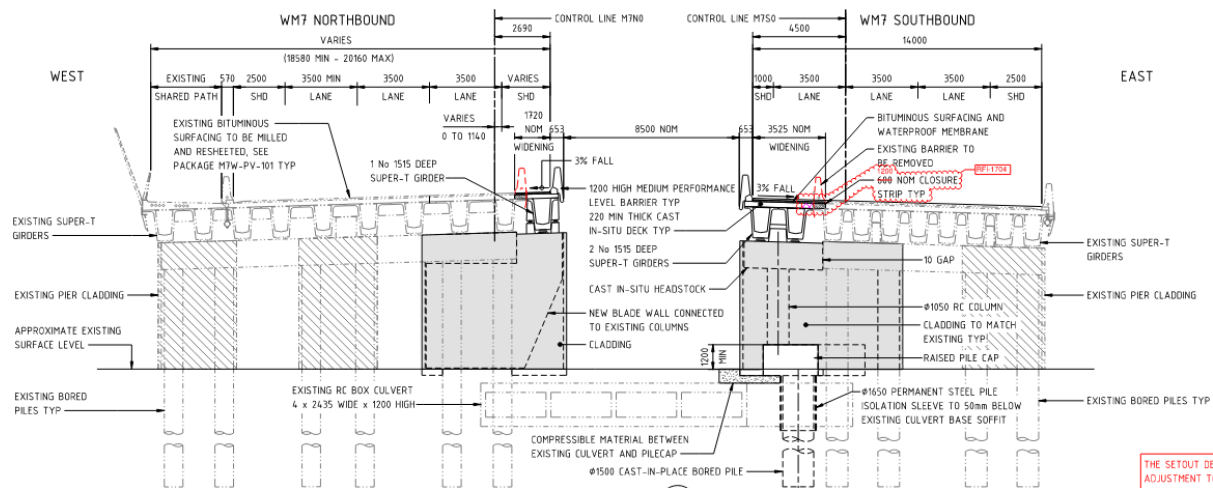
Pier 1 Arrangement at Bridge Widening Infra 27.0/27.1
